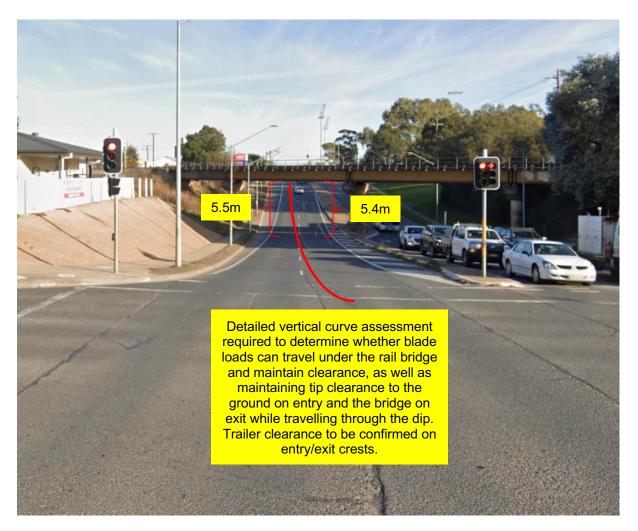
Sturt Hwy under Edward St Rail Bridge
